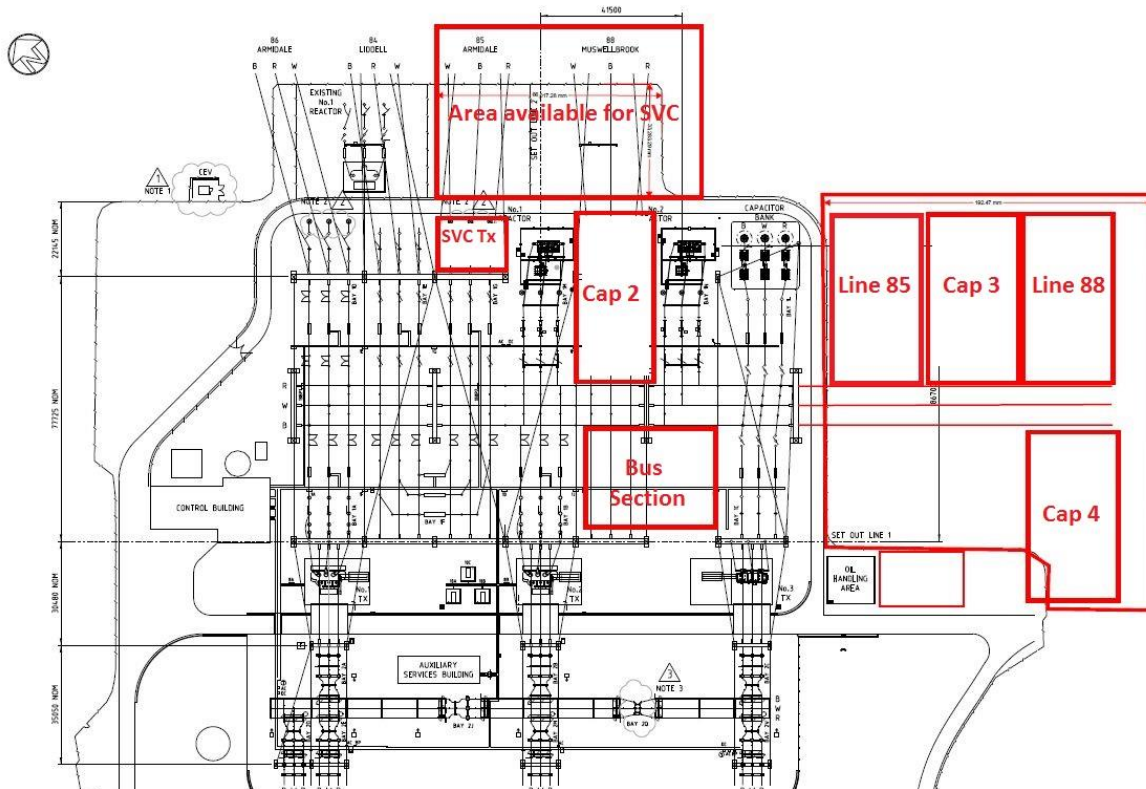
Proposed Arrangement of Tamworth 330 kV Substation
